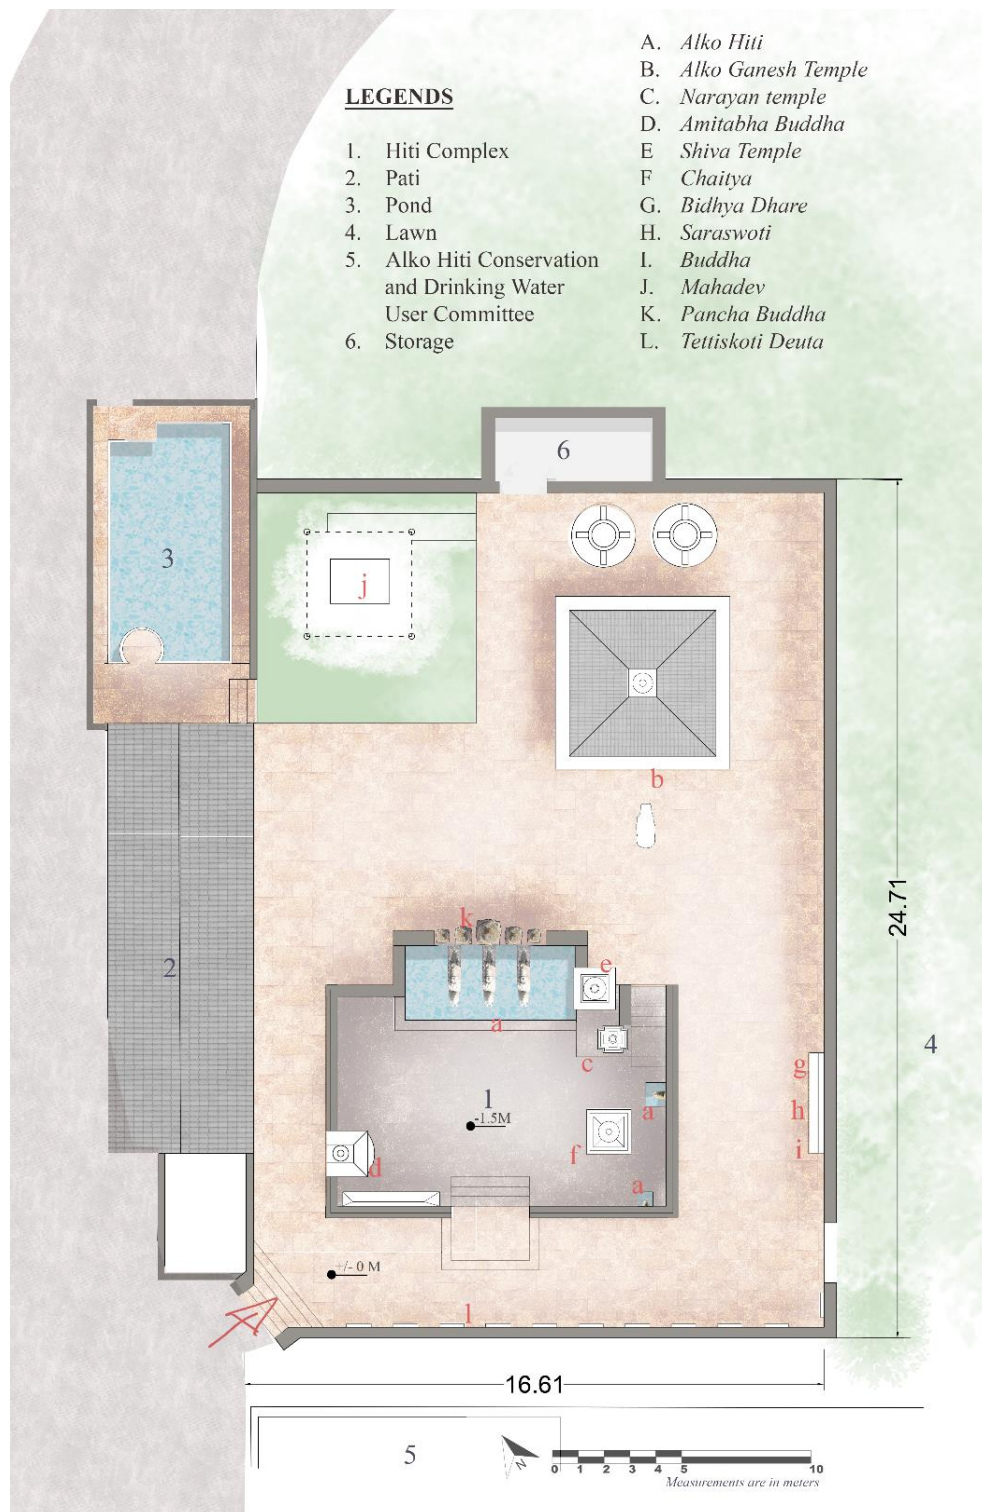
Site Plan of Alko Hiti Complex (Source: Author)
